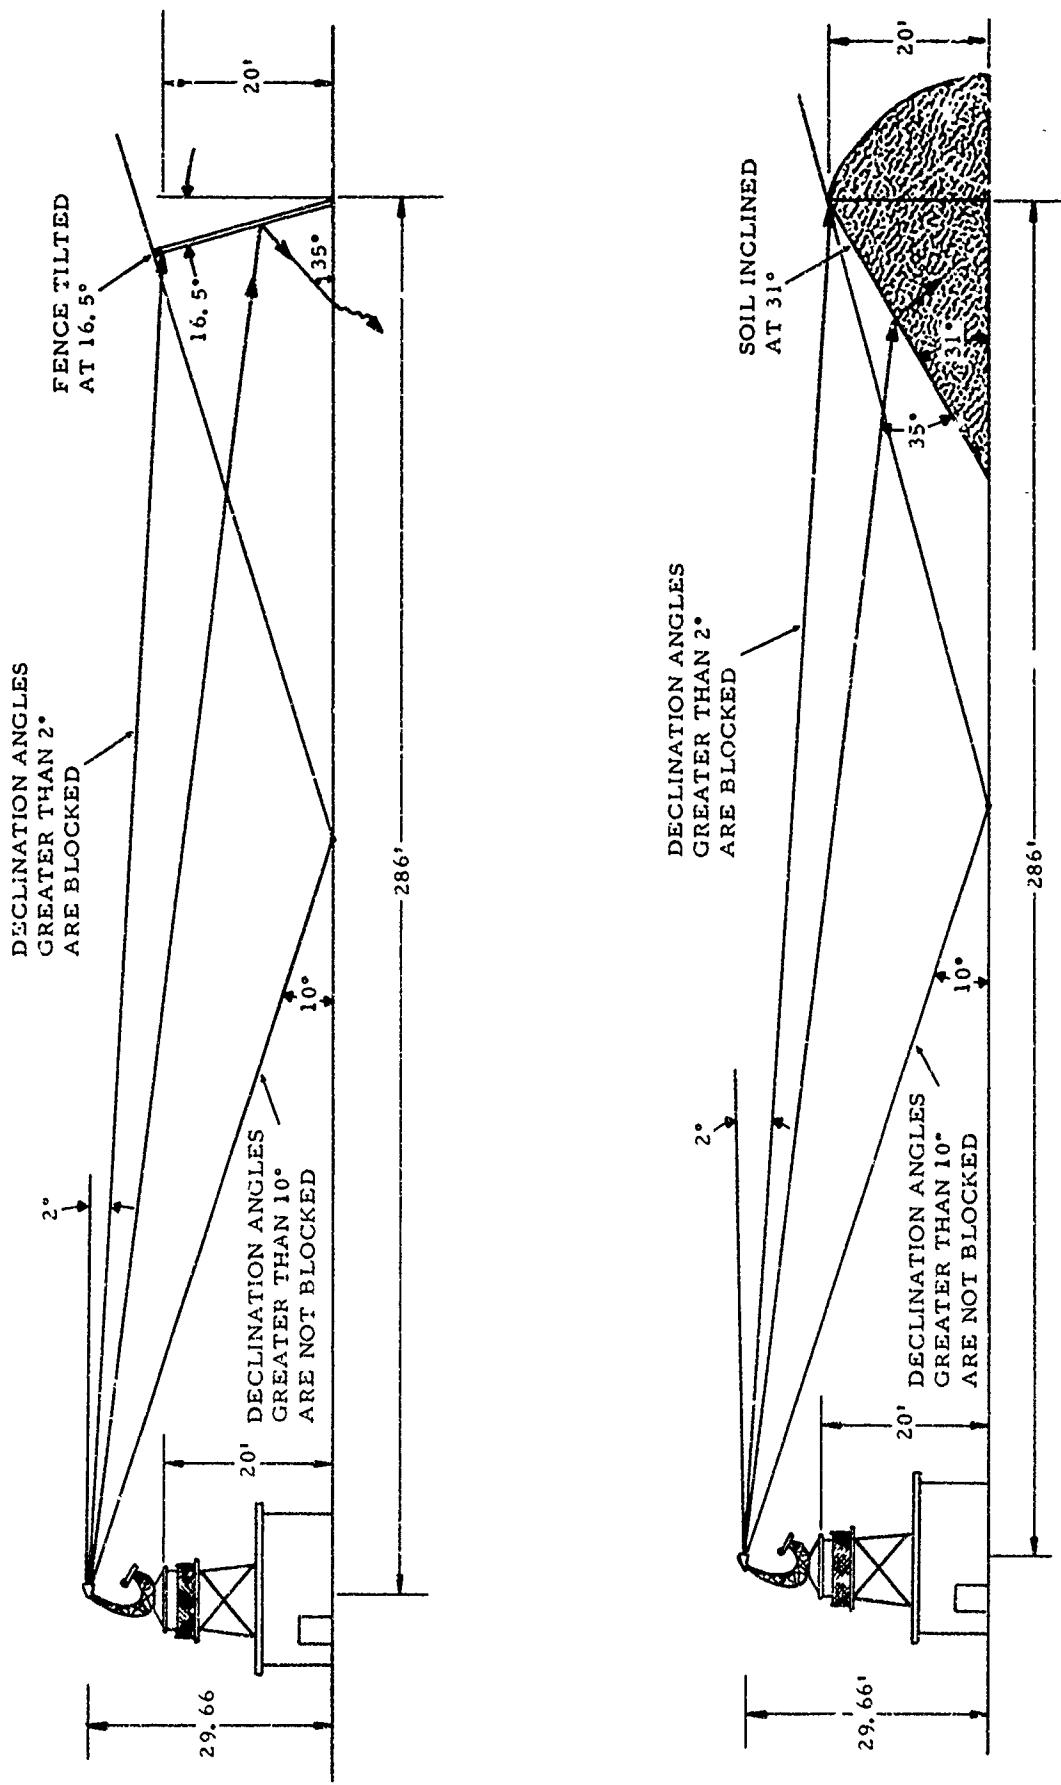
MODIFICATION OF ASR-4 SITE TO ELIMINATE VERTICAL LOBING
